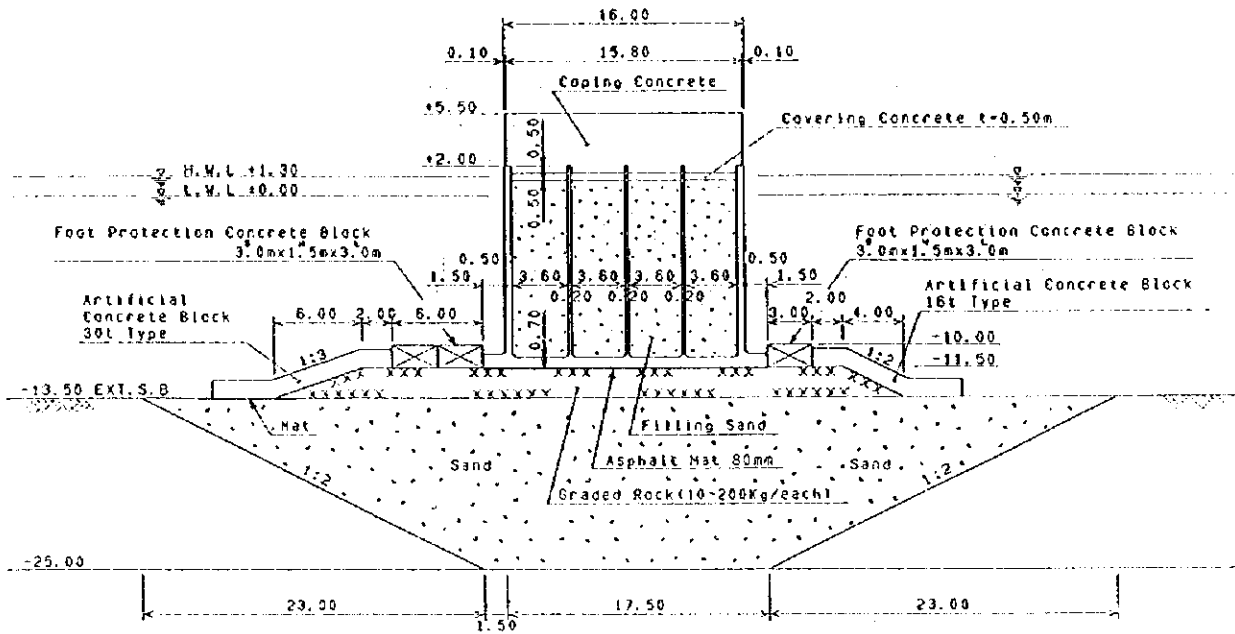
(1) Typical Cross Section of Breakwater (RC Caisson)
